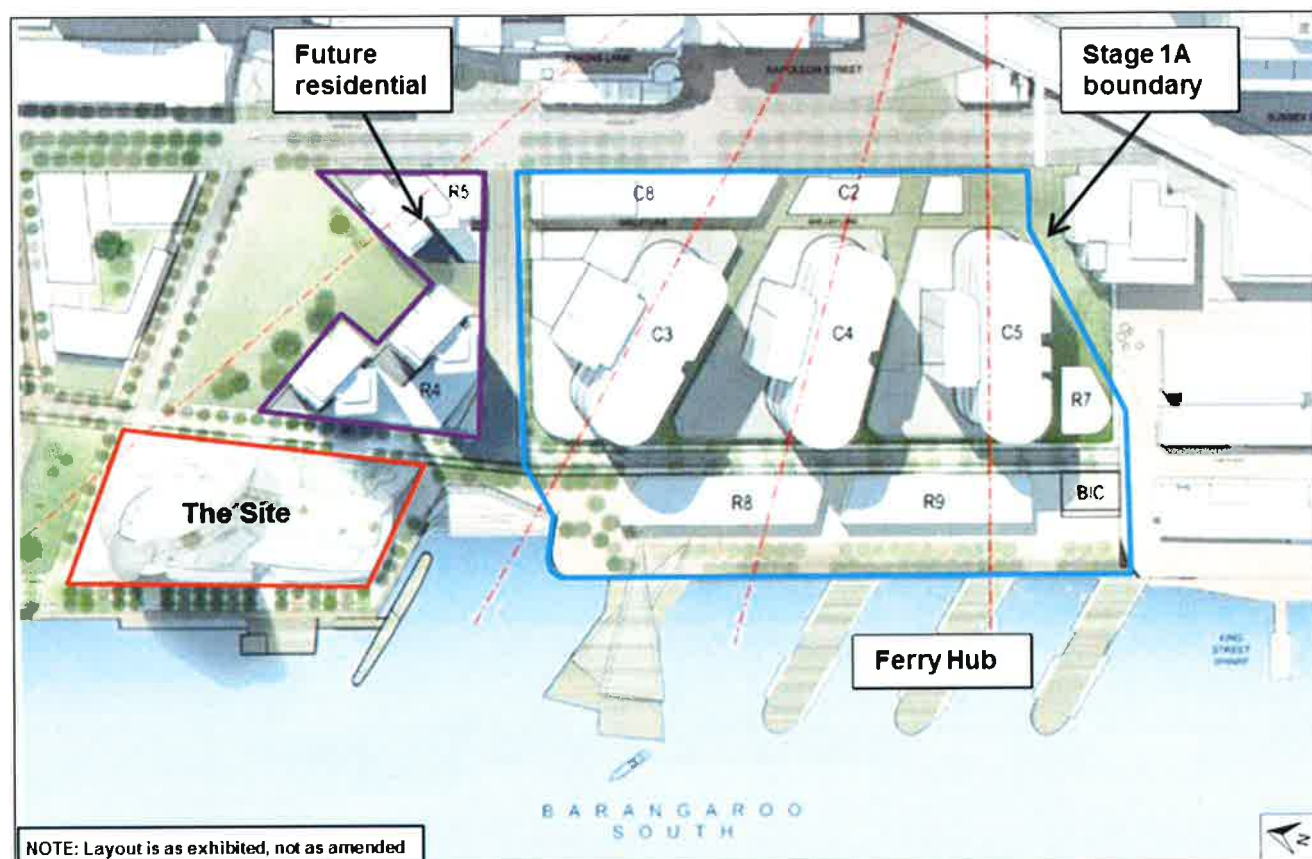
The site (outlined in red) overlaid on MOD 8 layout together with current construction works, completed buildings and public domain works (outlined in blue) at Barangaroo South (Base source: Applicant's EIS – as exhibited)
